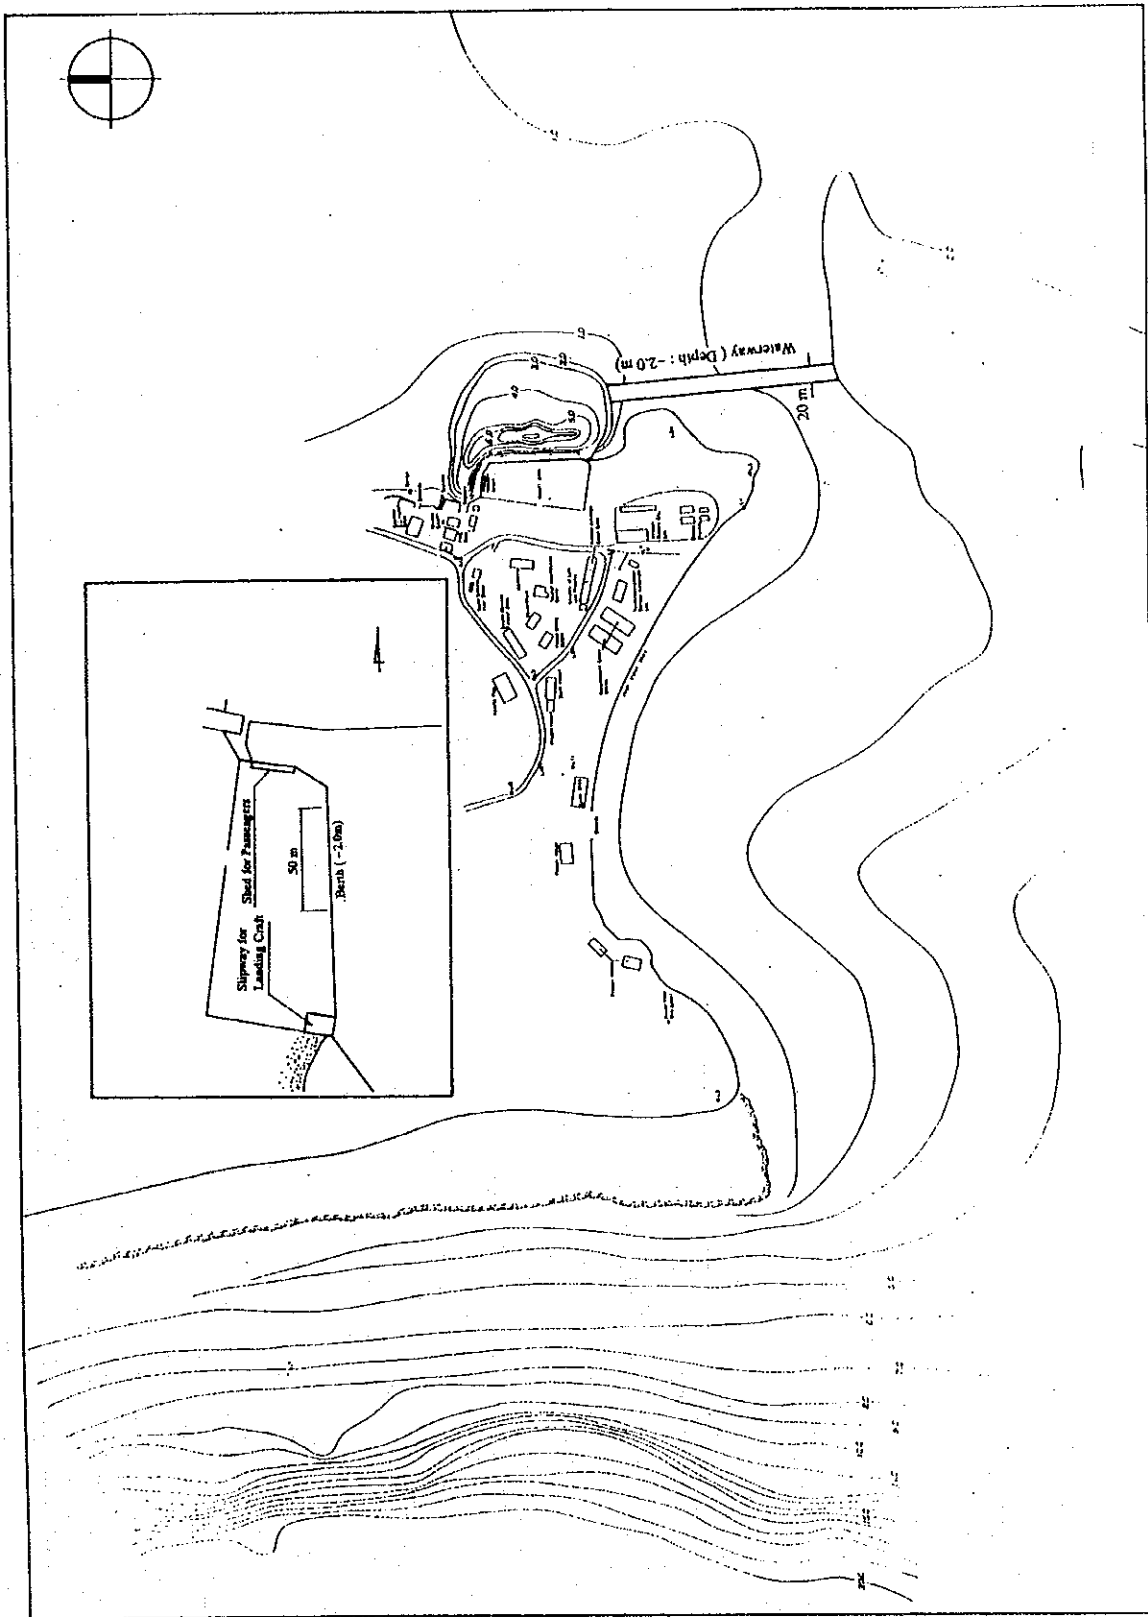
(1) Conceptual Development Plan of London Wharf, Alternative Plan 3
